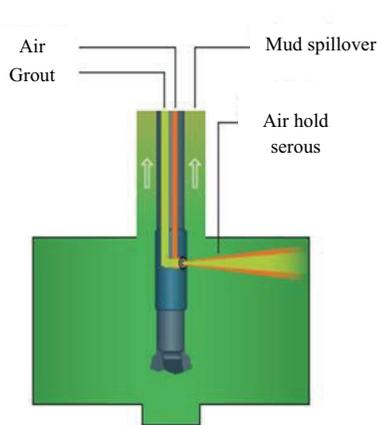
Double pipe method of high-pressure jet grouting pile (D-construction method)
